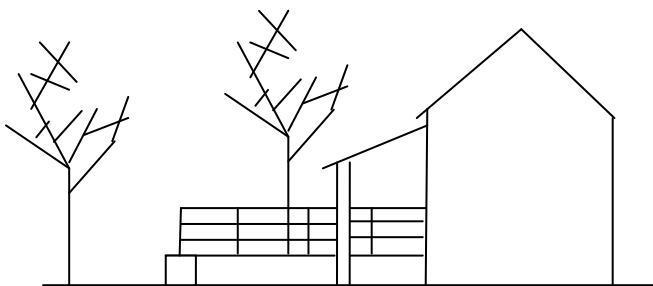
The preferred street boundary condition should include a low stub wall (max 700mm). Metal rails may be secured to the top of the low stub wall but must match the stoep handrails. The preferred spacing of the horizontal members is 150mm with supports of the same material as the fence itself. Masonry piers are not permitted.
